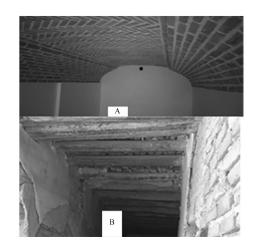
Basement Floor Ceiling (a) and Ground Floor Ceiling (b)
